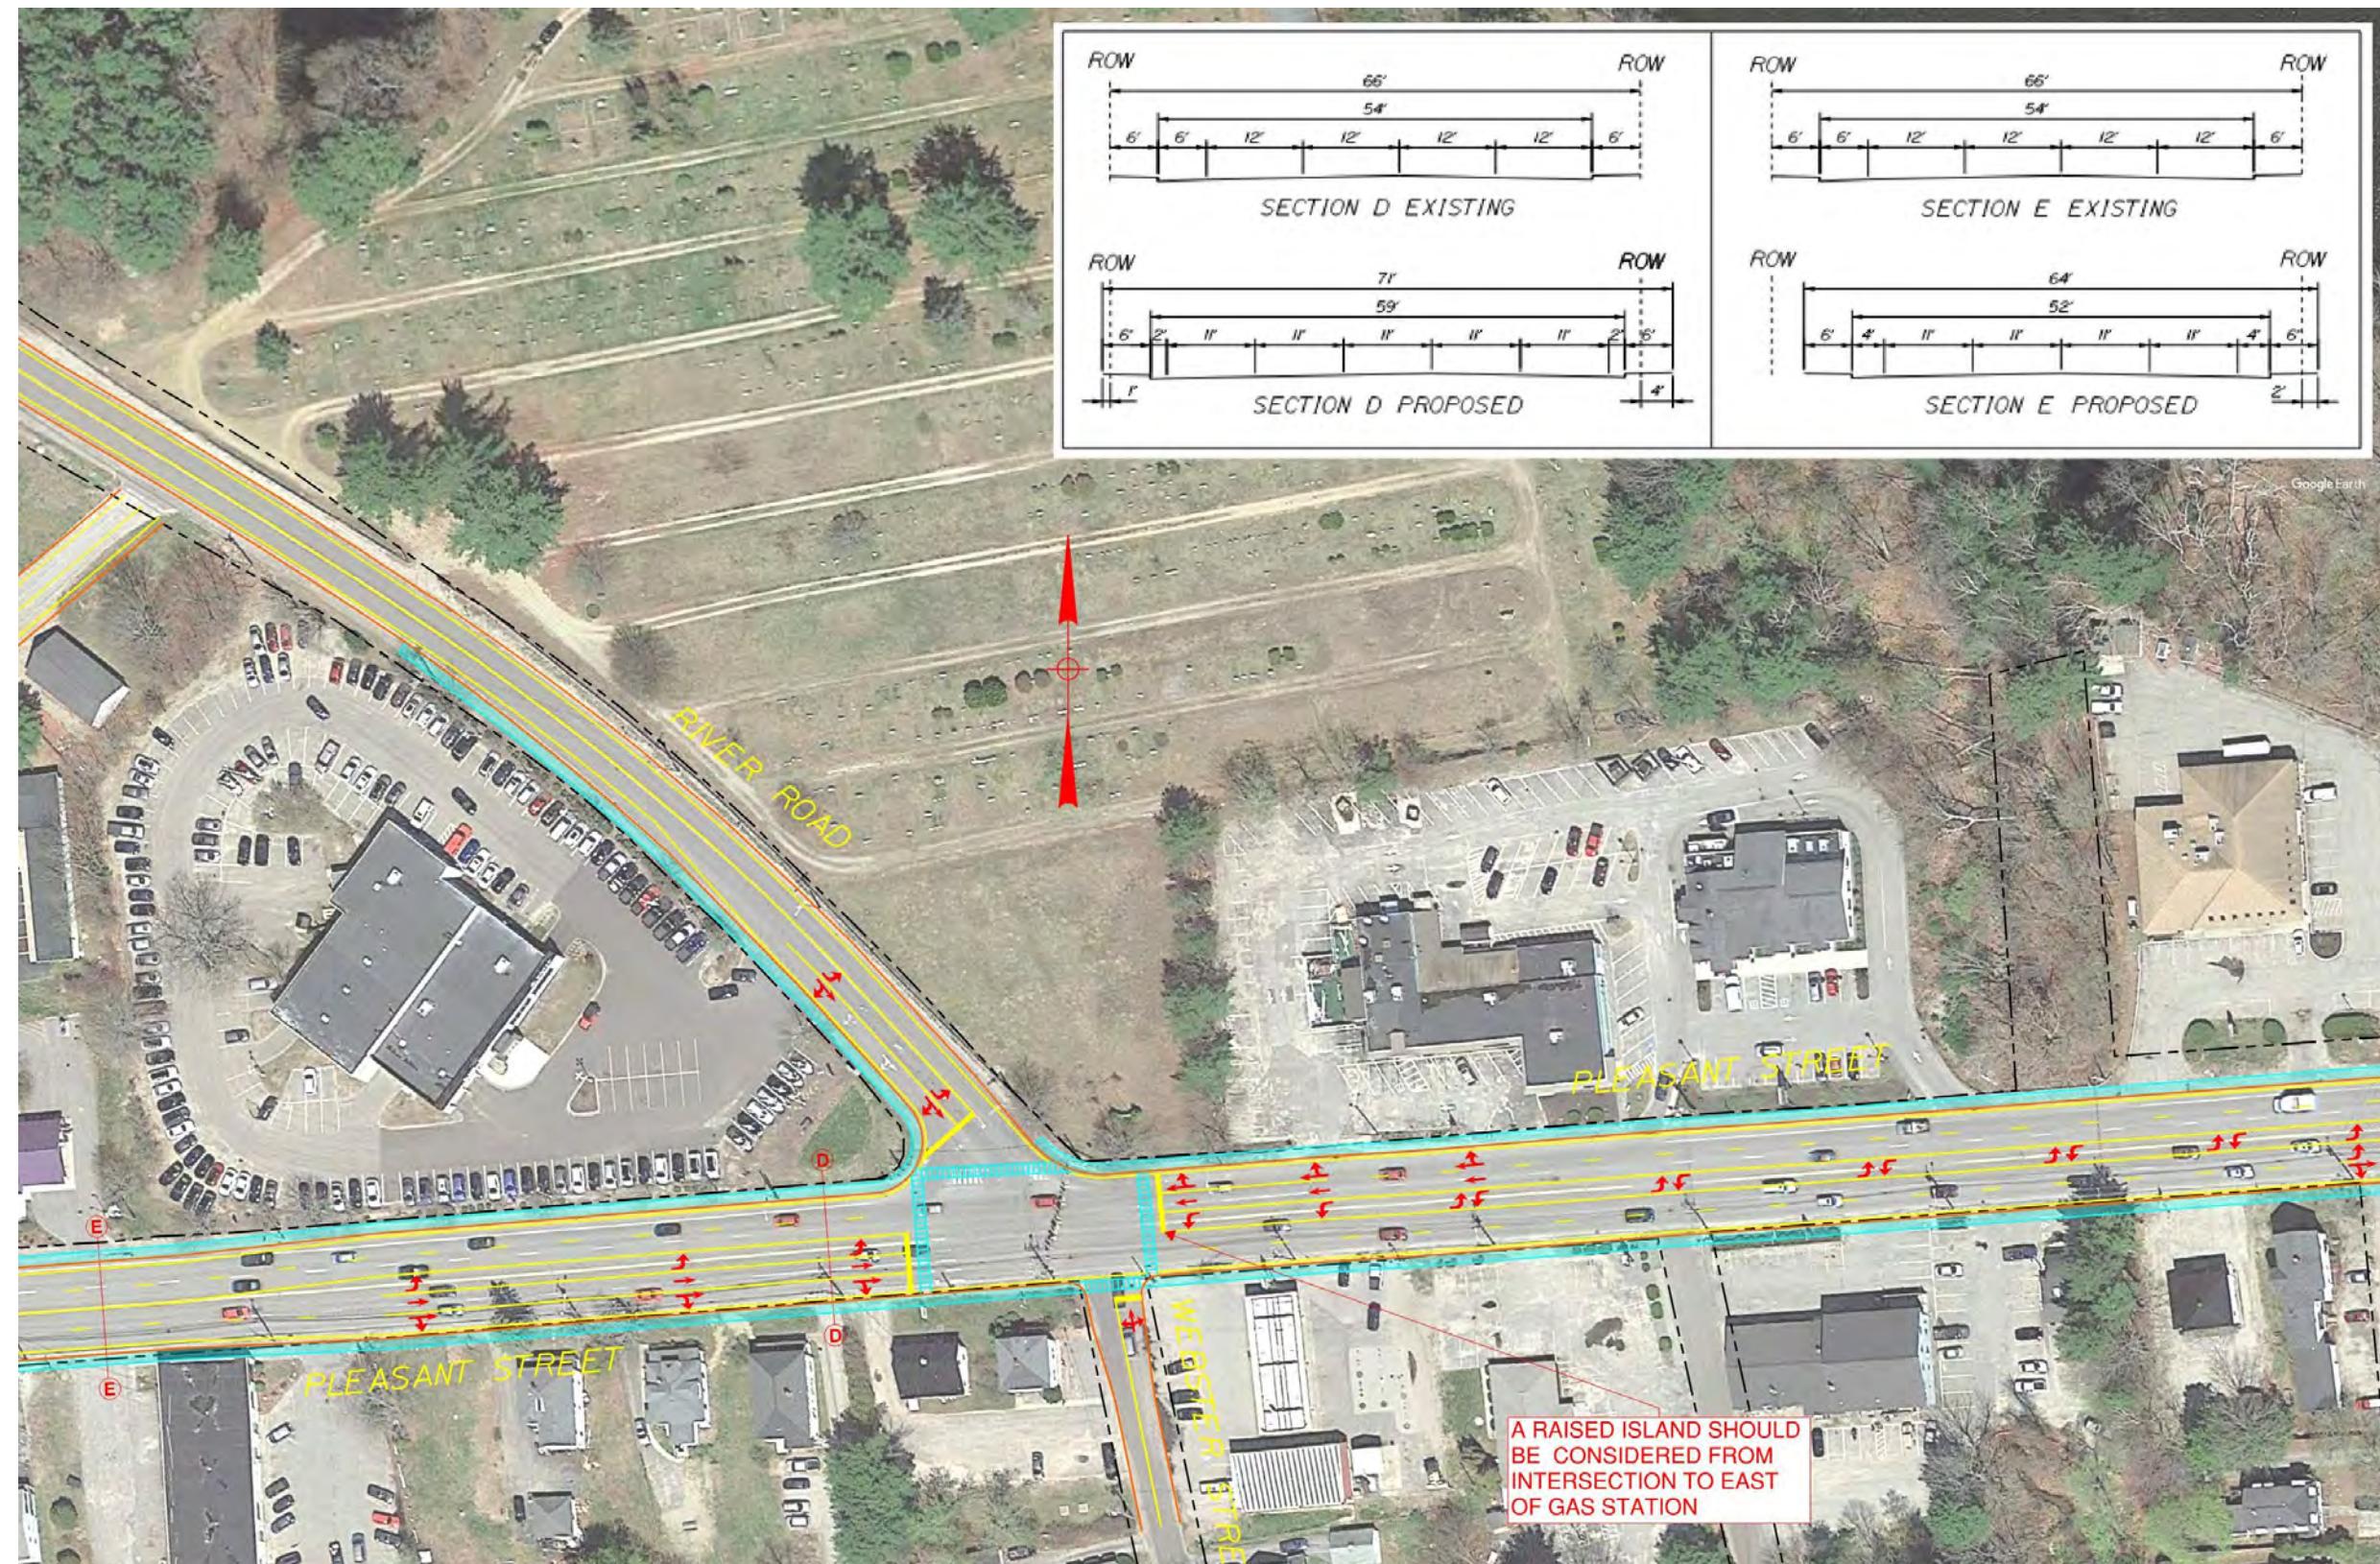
Pleasant Street/River Road/Webster Street Improvements
